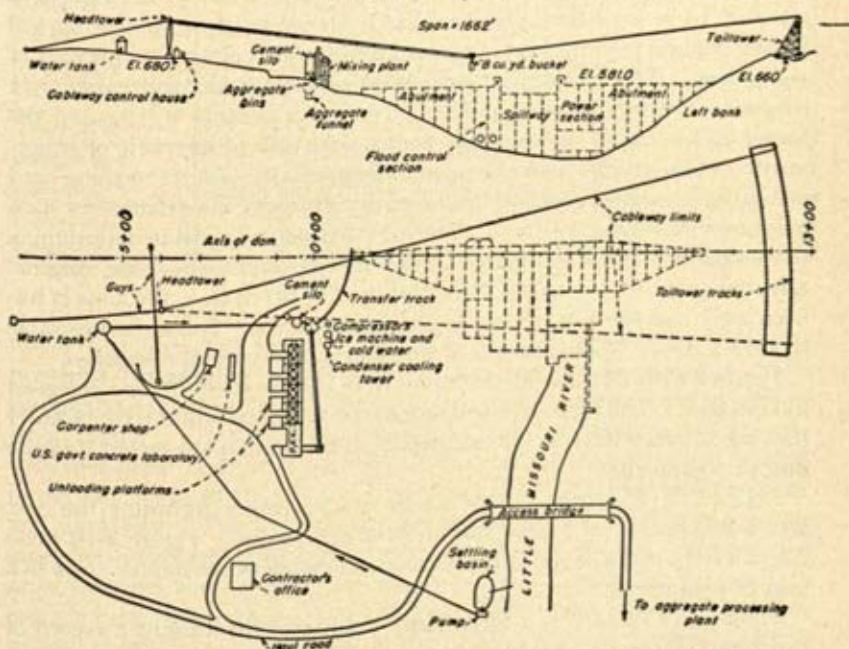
Job layout for the Narrows Dam. (Engineering News-Record.)
